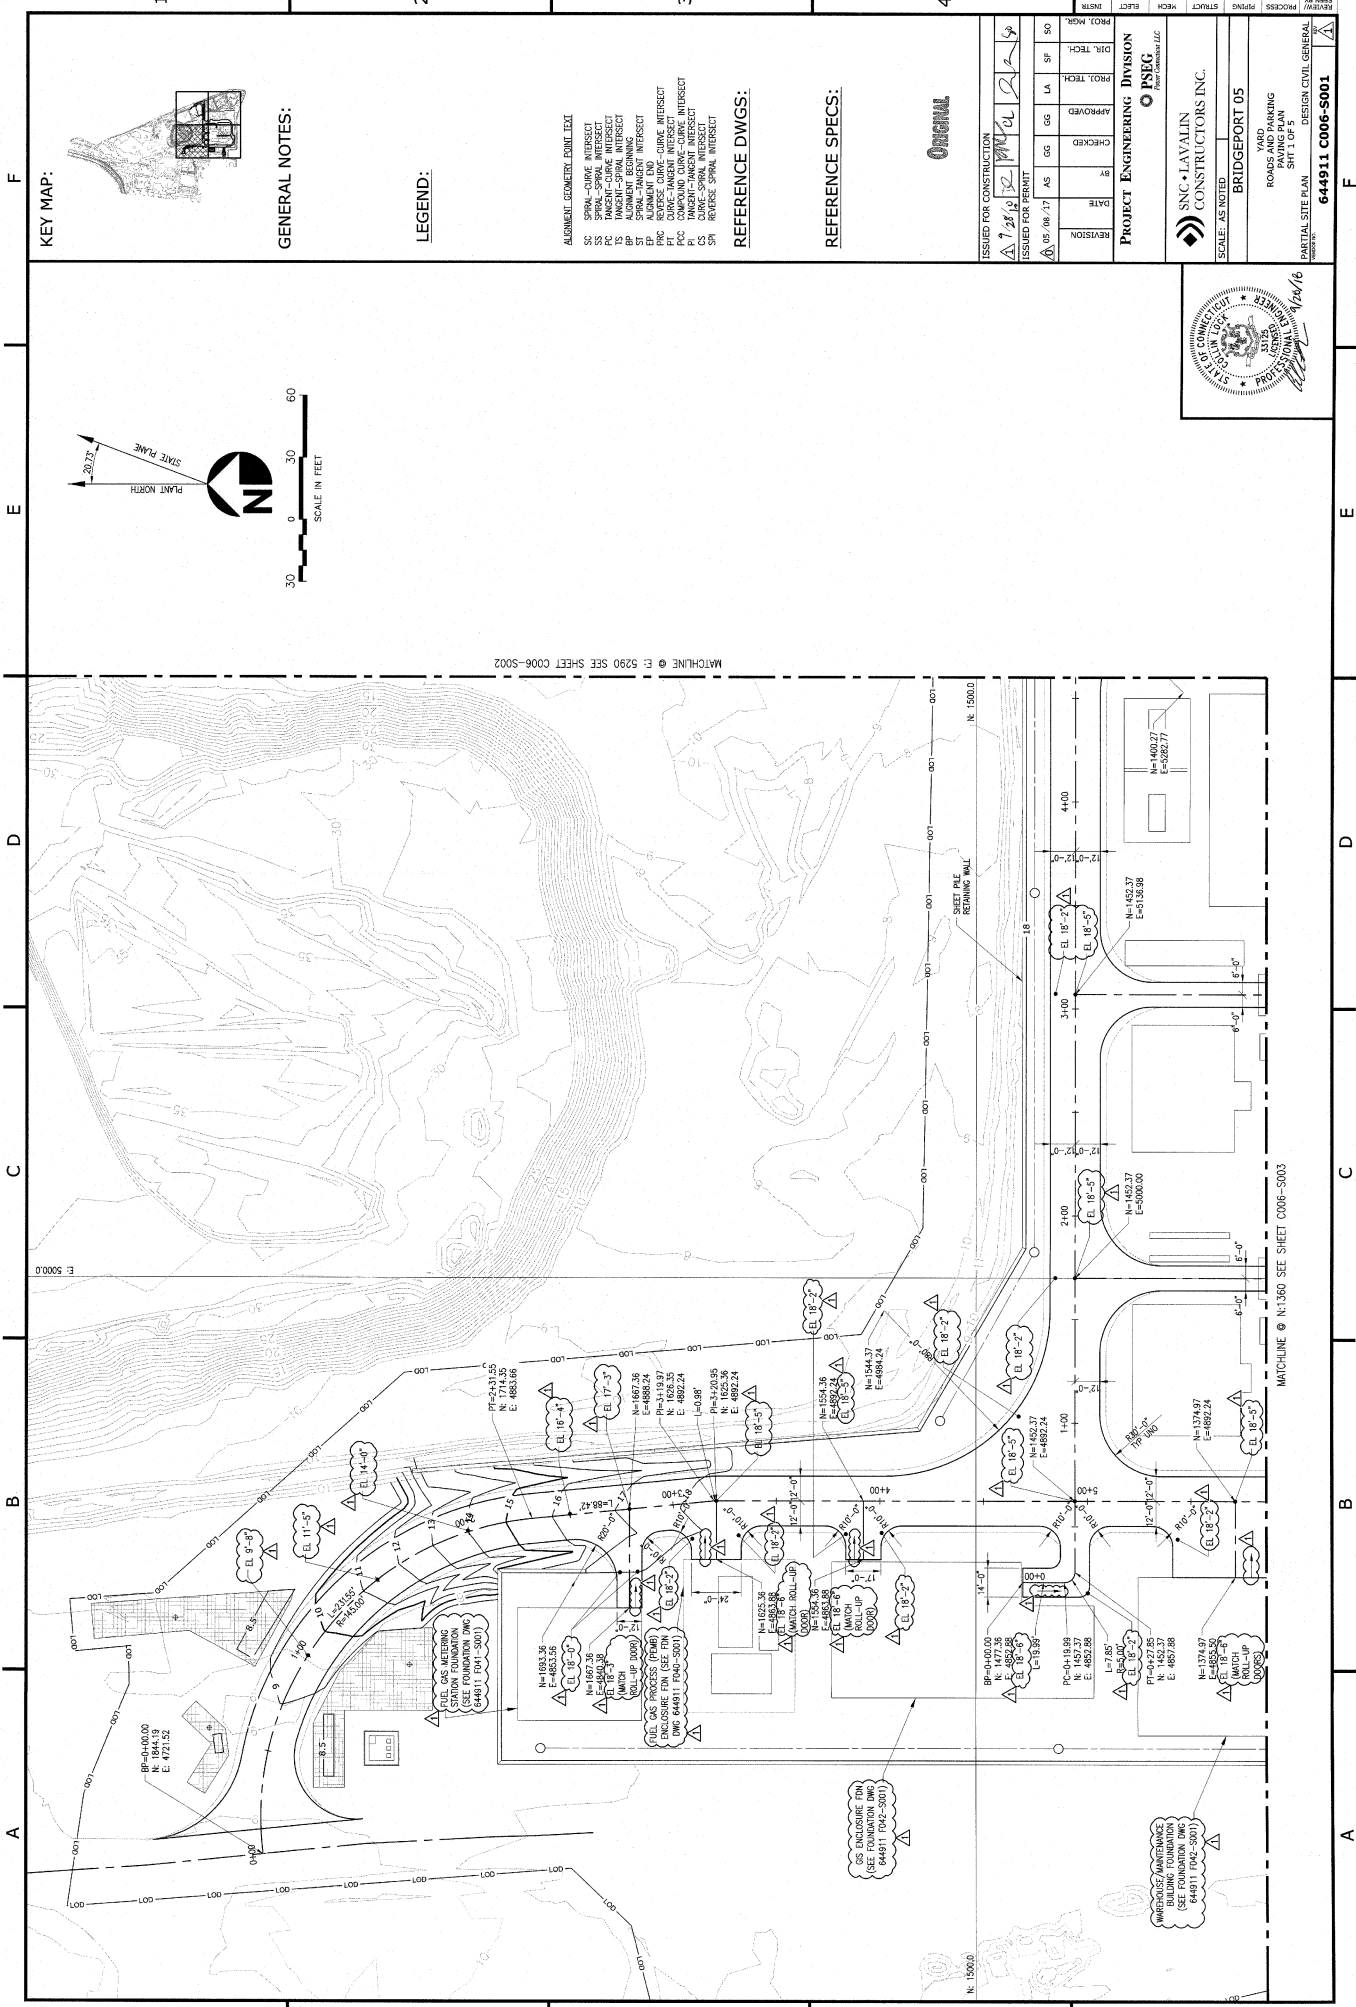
Onsite Underground Utility Design, Site Finishing, and Grading Plans
